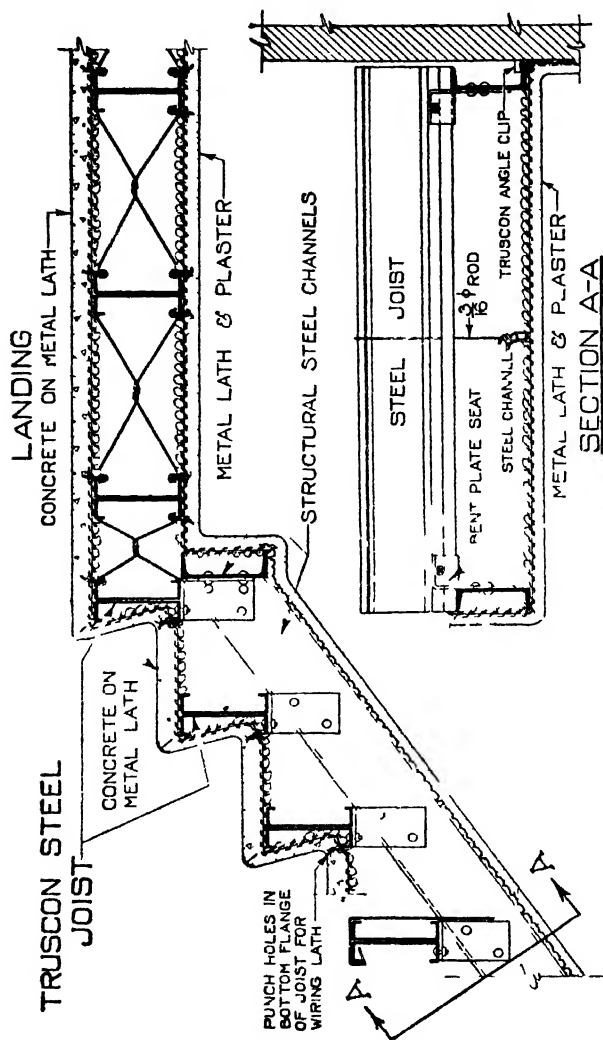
and 523. This detail shows the construction of a landing with plaster on metal lath supporting joists are placed as close as possible to the joists. The angle brackets for the steel joists being riveted onto the stringers in the lab ceiling plate.
